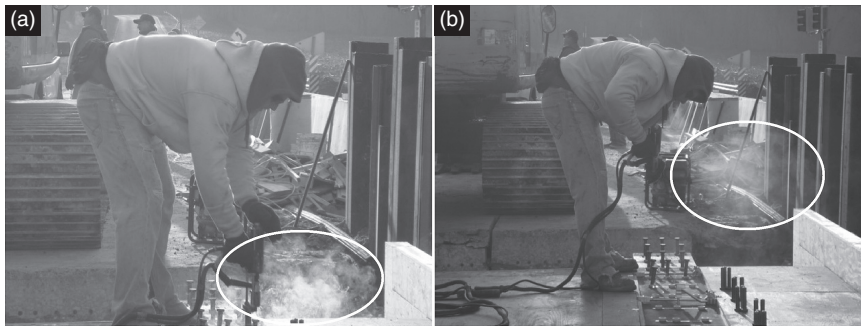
Movement of welding fume plume from generation at the base material (a) to near the breathing zone upon completion of the weld (b).
